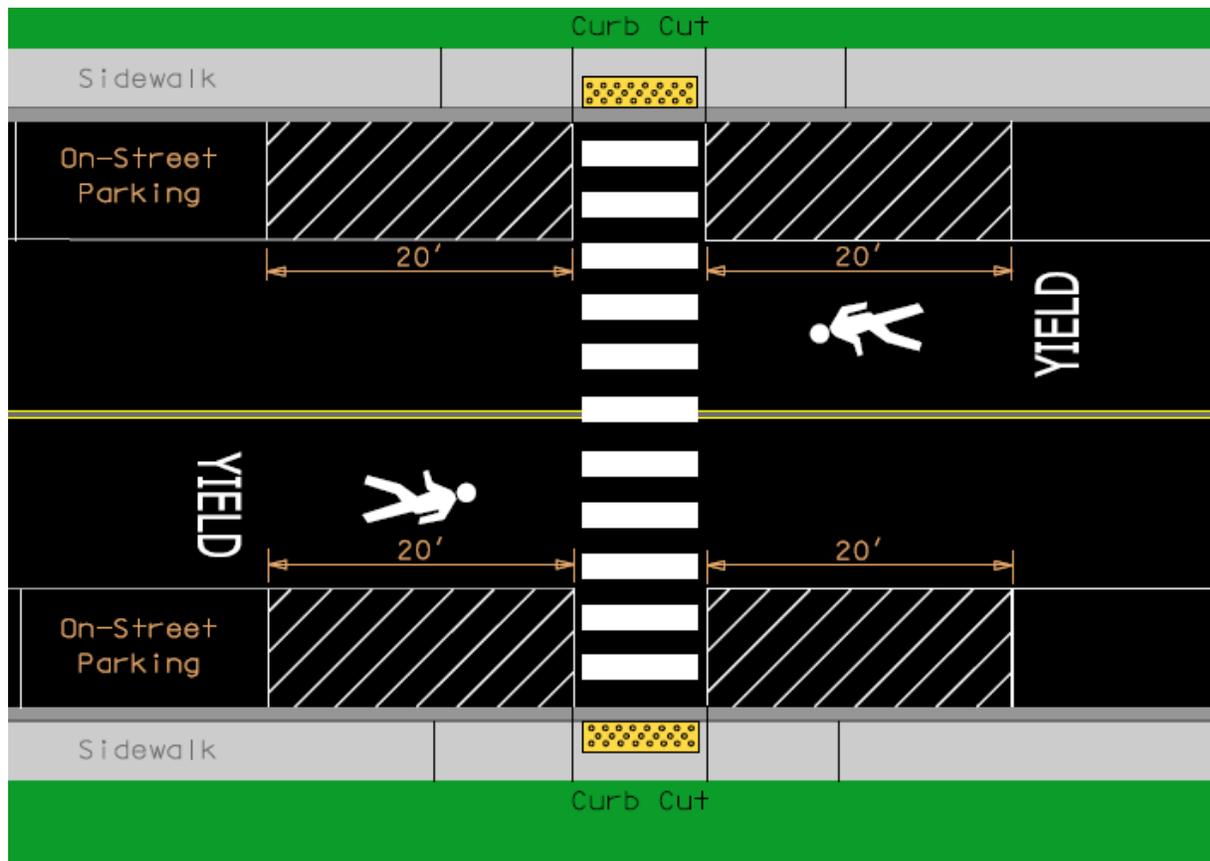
Sidewalk with Crosswalk and Associated Stenciling
